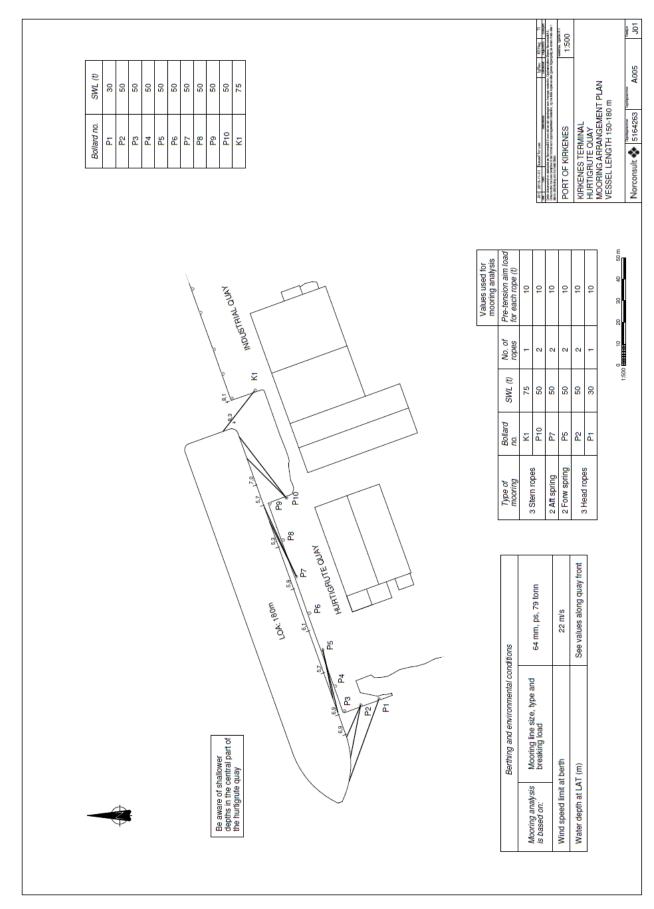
Mooring plan Hurtigrute Quay, LOA 150 - 180m
